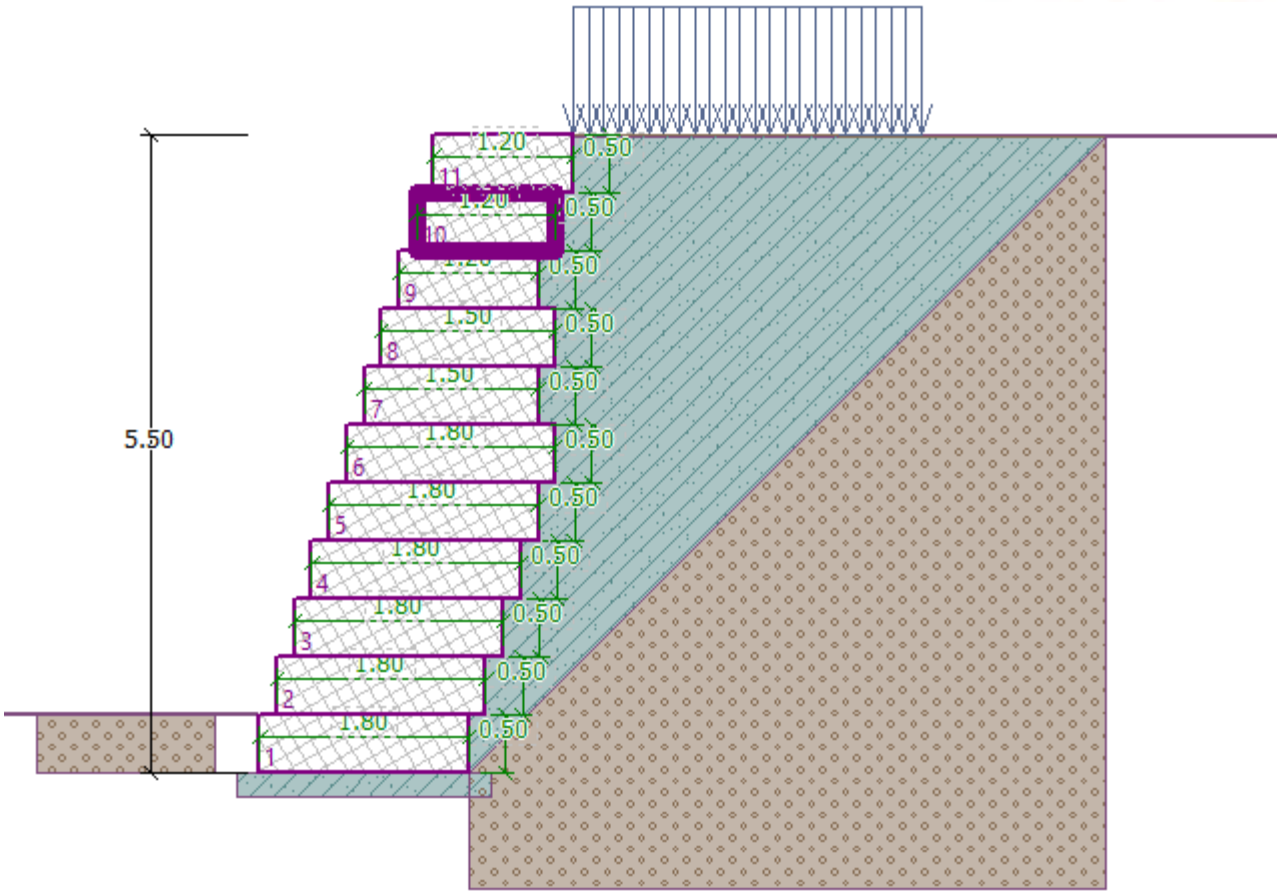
Sample of Category 4 Retaining Wall with 0.5% Reverse Slope Behind
